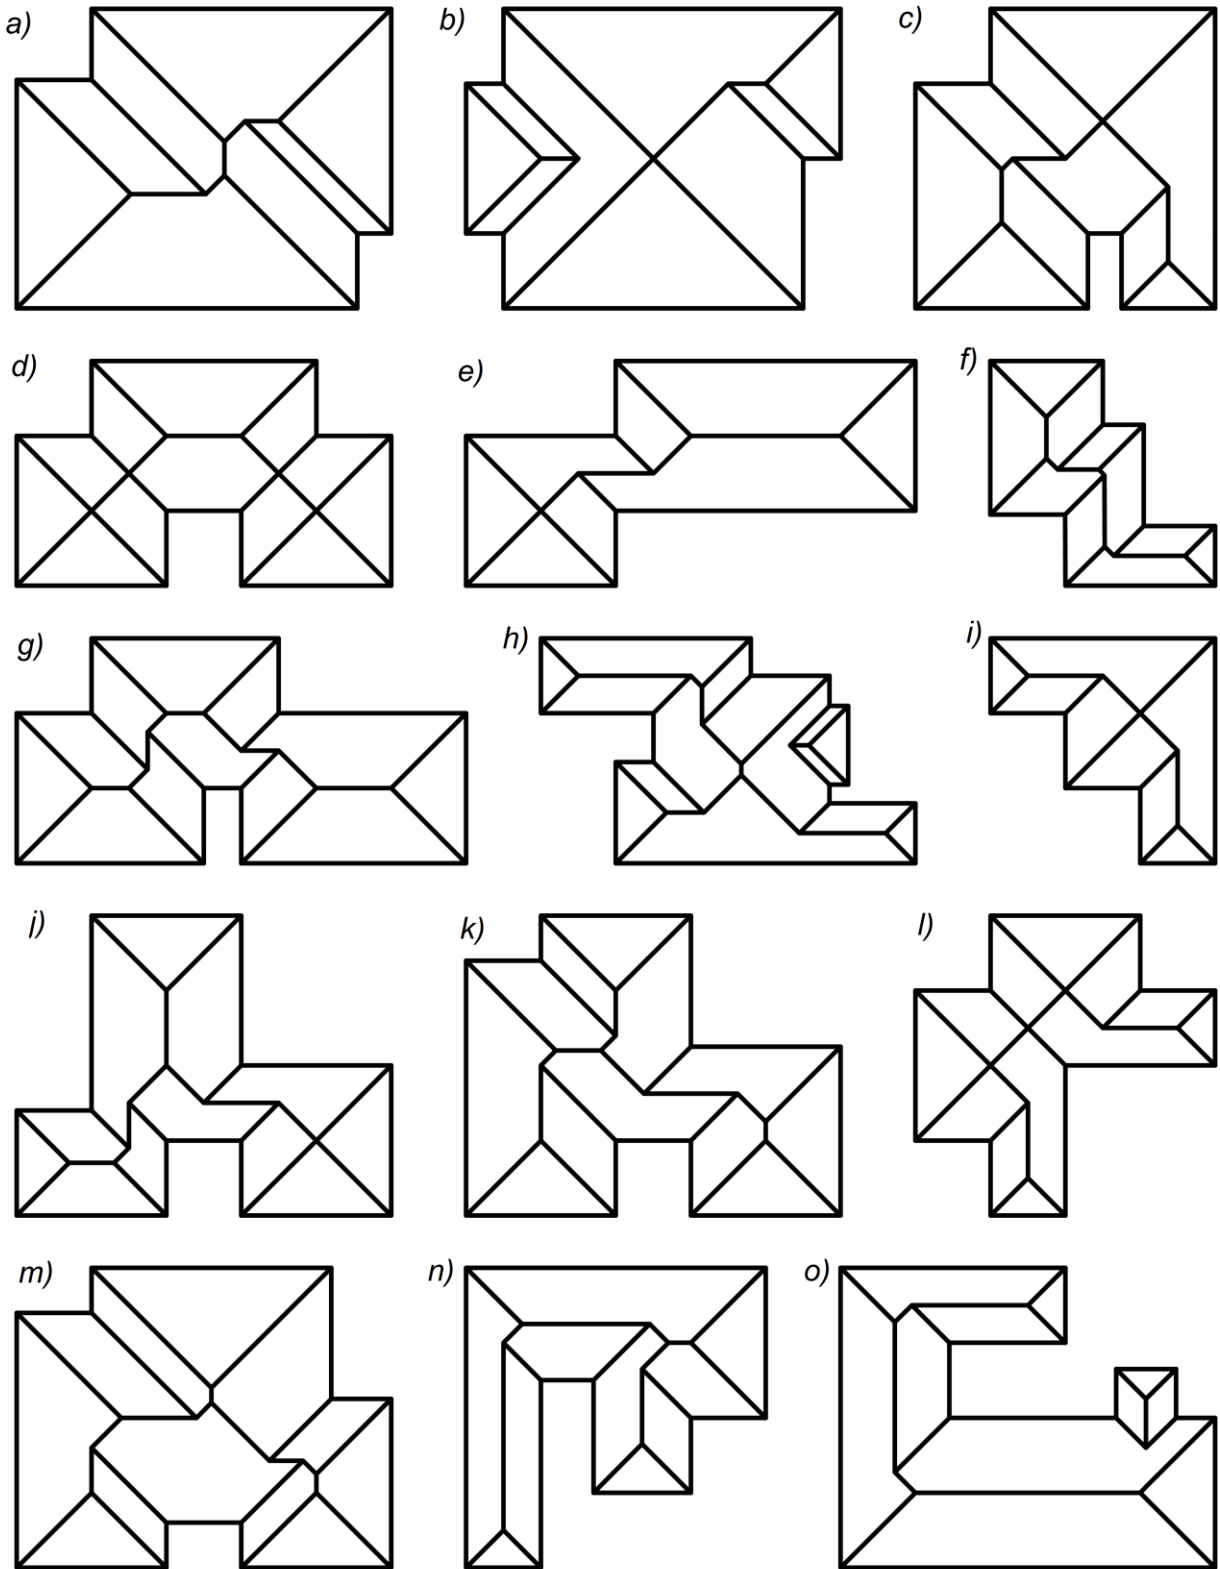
Examples of roofs of buildings with a complex shape in plan
